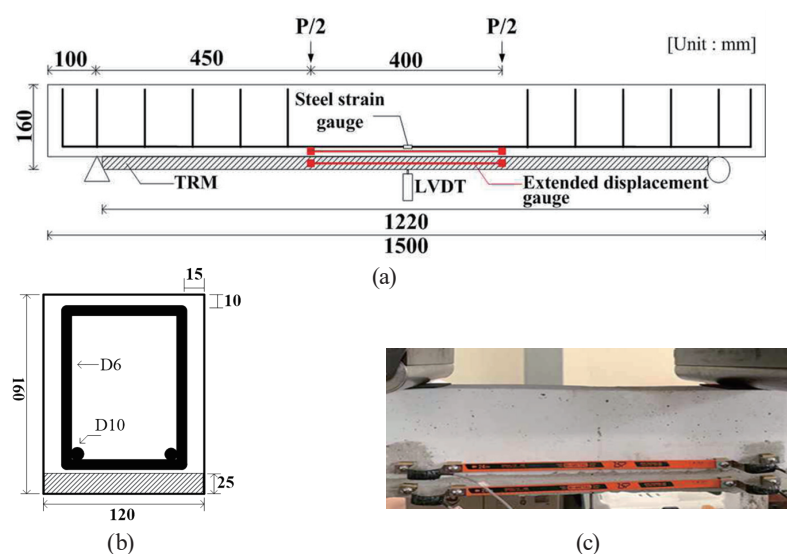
(Color online) Specifications and test setup of specimens. (a) Front view. (b) Cross-sectional view at center. (c) Extended displacement crack gauge.
